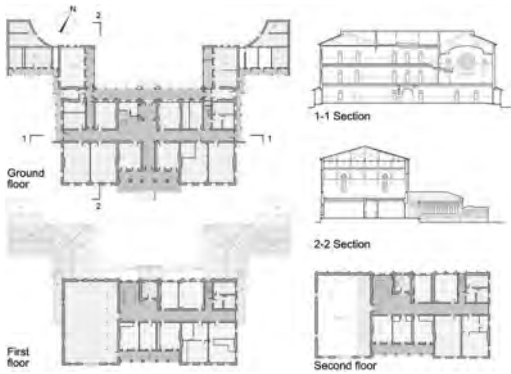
Plans and sections of Allen Hall (built in 1901–4) (drawings by Suzhou Jicheng Conservation Co. and Soochow University students 2019).
